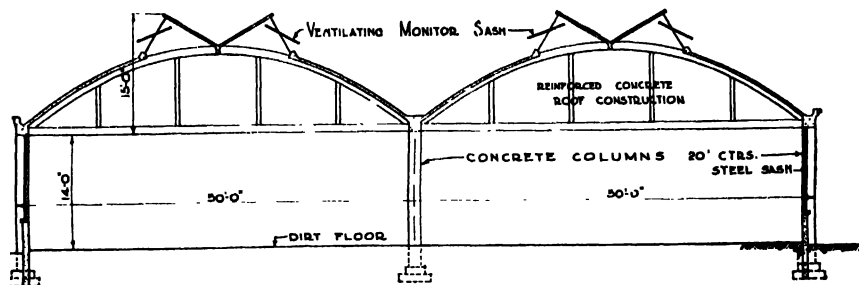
Foundries of combination flat slab and arch roof construction.
